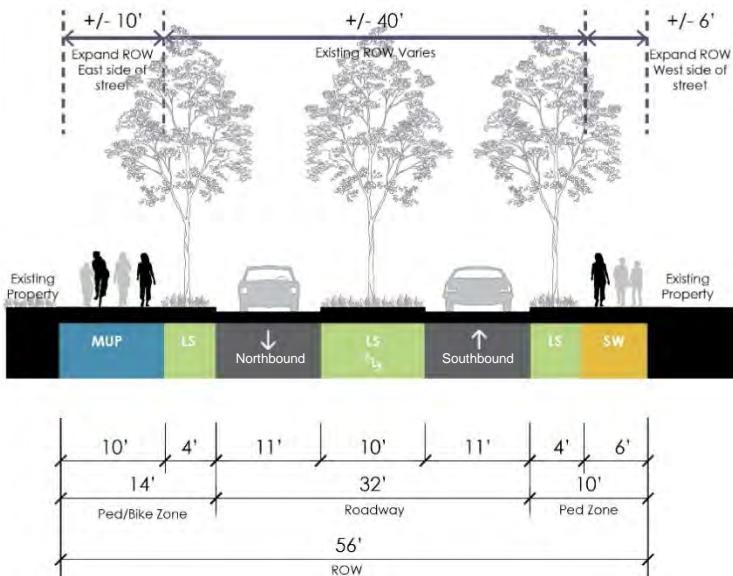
'Front Door' Entry—Road and Hartford Road Realignment (View Looking South Between 22nd Street NE to 20th Street NE)
